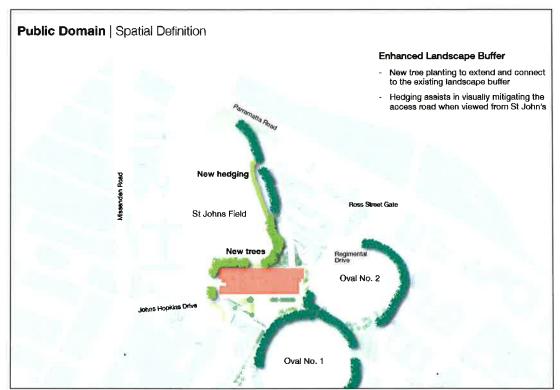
Public Domain plan identifying additional landscaping works adjacent to the proposed access road and Charles Perkins Centre building
